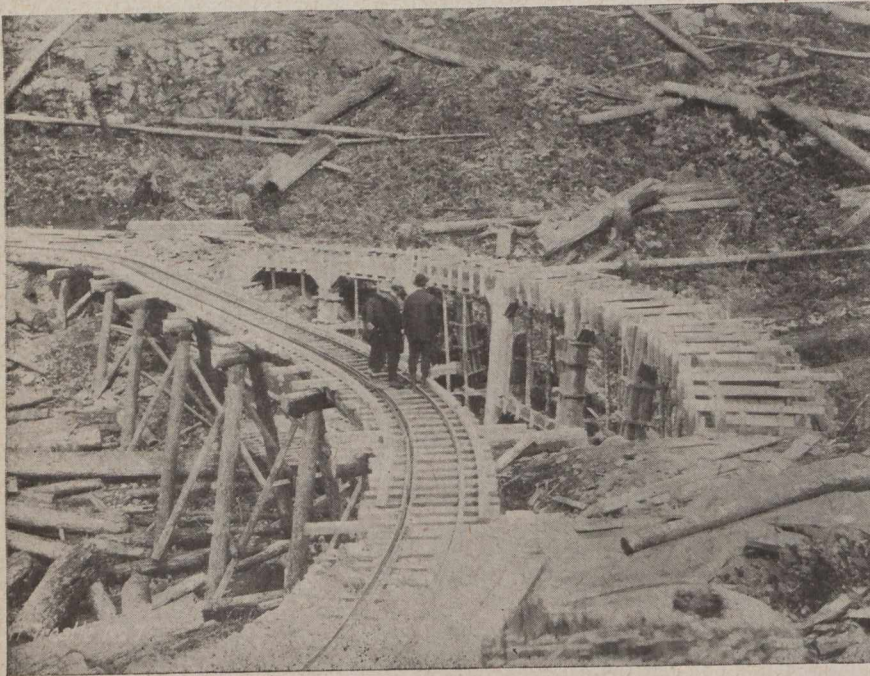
View Showing Timber Trestle of Construction Railway and Concrete Trestle for the Pipe Line.
